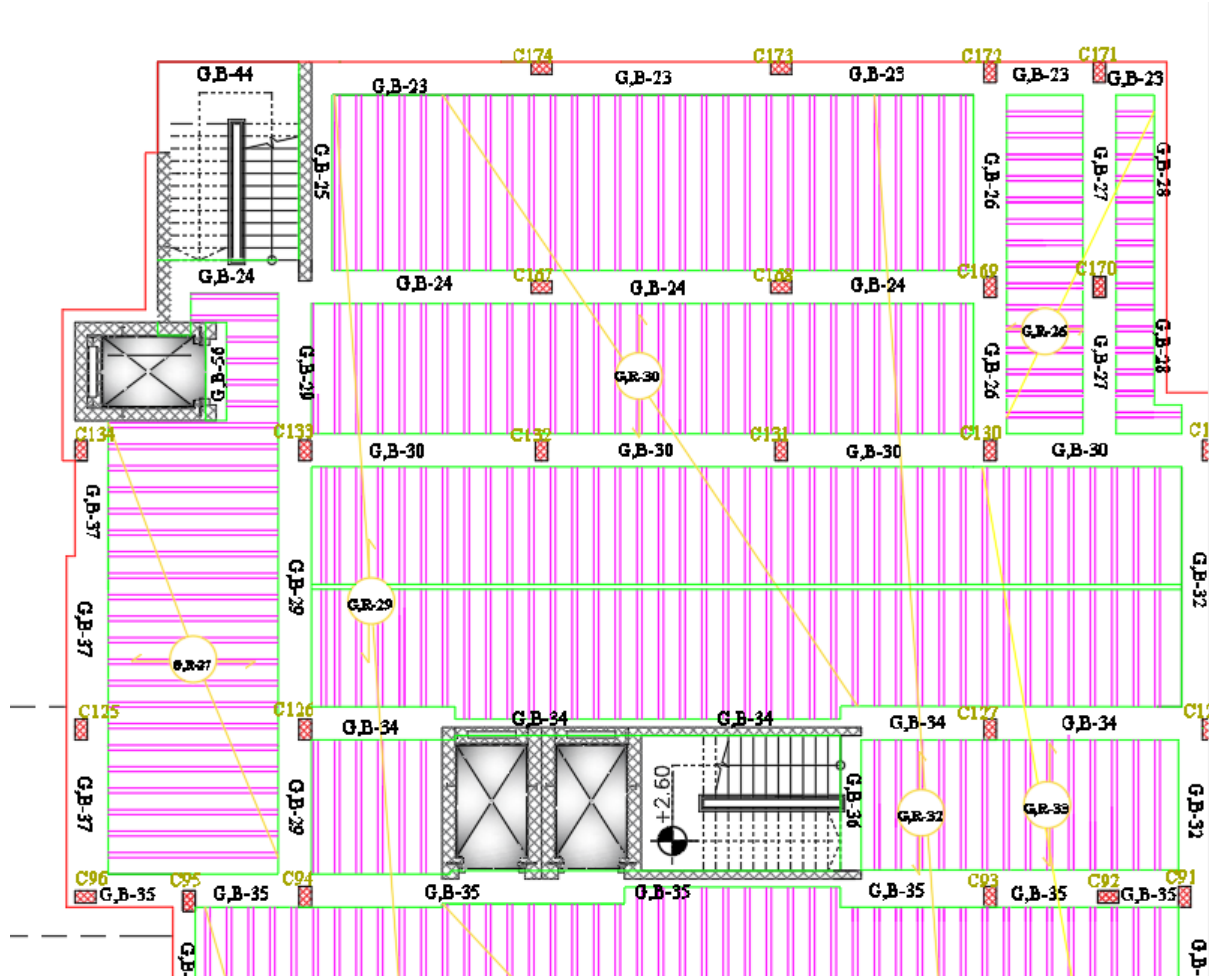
1):Rib (G,R-30) Location in ground Slab
